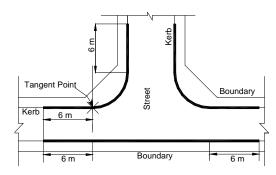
Restricted locations of driveways entry as shown heavy edged lines.
